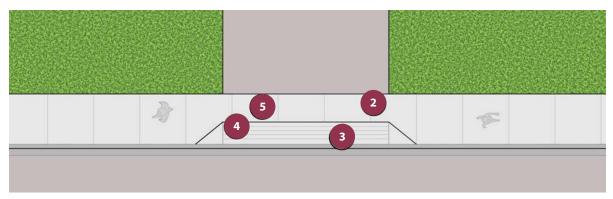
// Driveway crossing of Non-Separated Sidewalk
